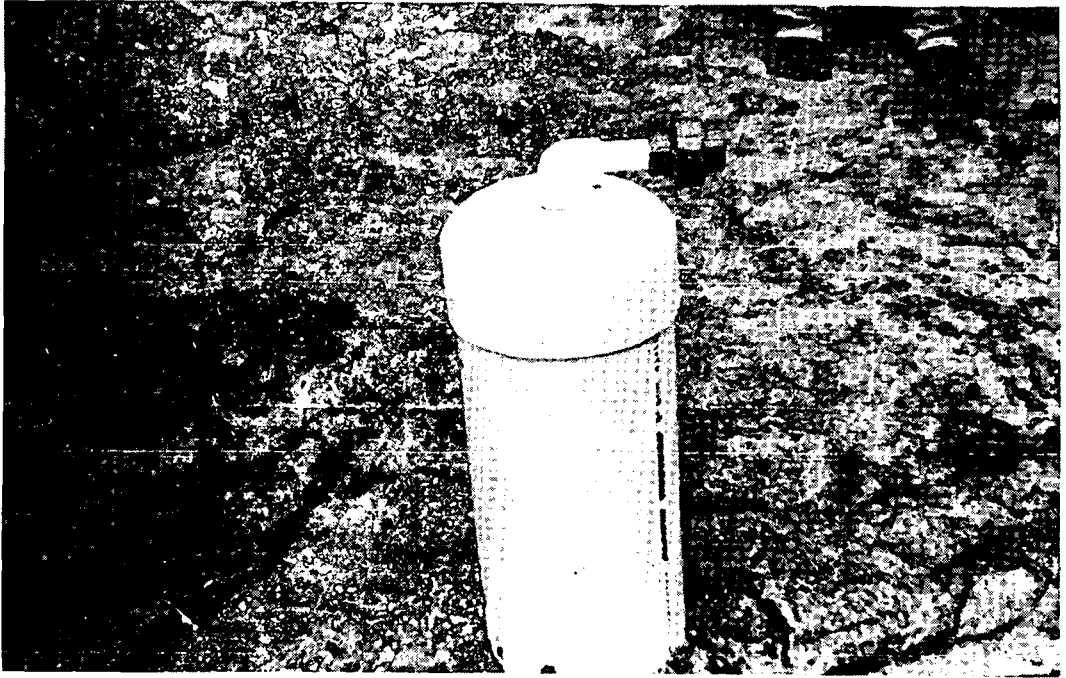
Installing the union/elbow assembly. Use PVC glue to attach the elbow end of the assembly to the well pipe. (Note: before gluing, rough edges of the pipe end should be removed with a knife and the end of the pipe should be sanded lightly). After gluing, the elbow will rest on the well cap keeping the pump 6 inches from the aggregate at the bottom of the well.
